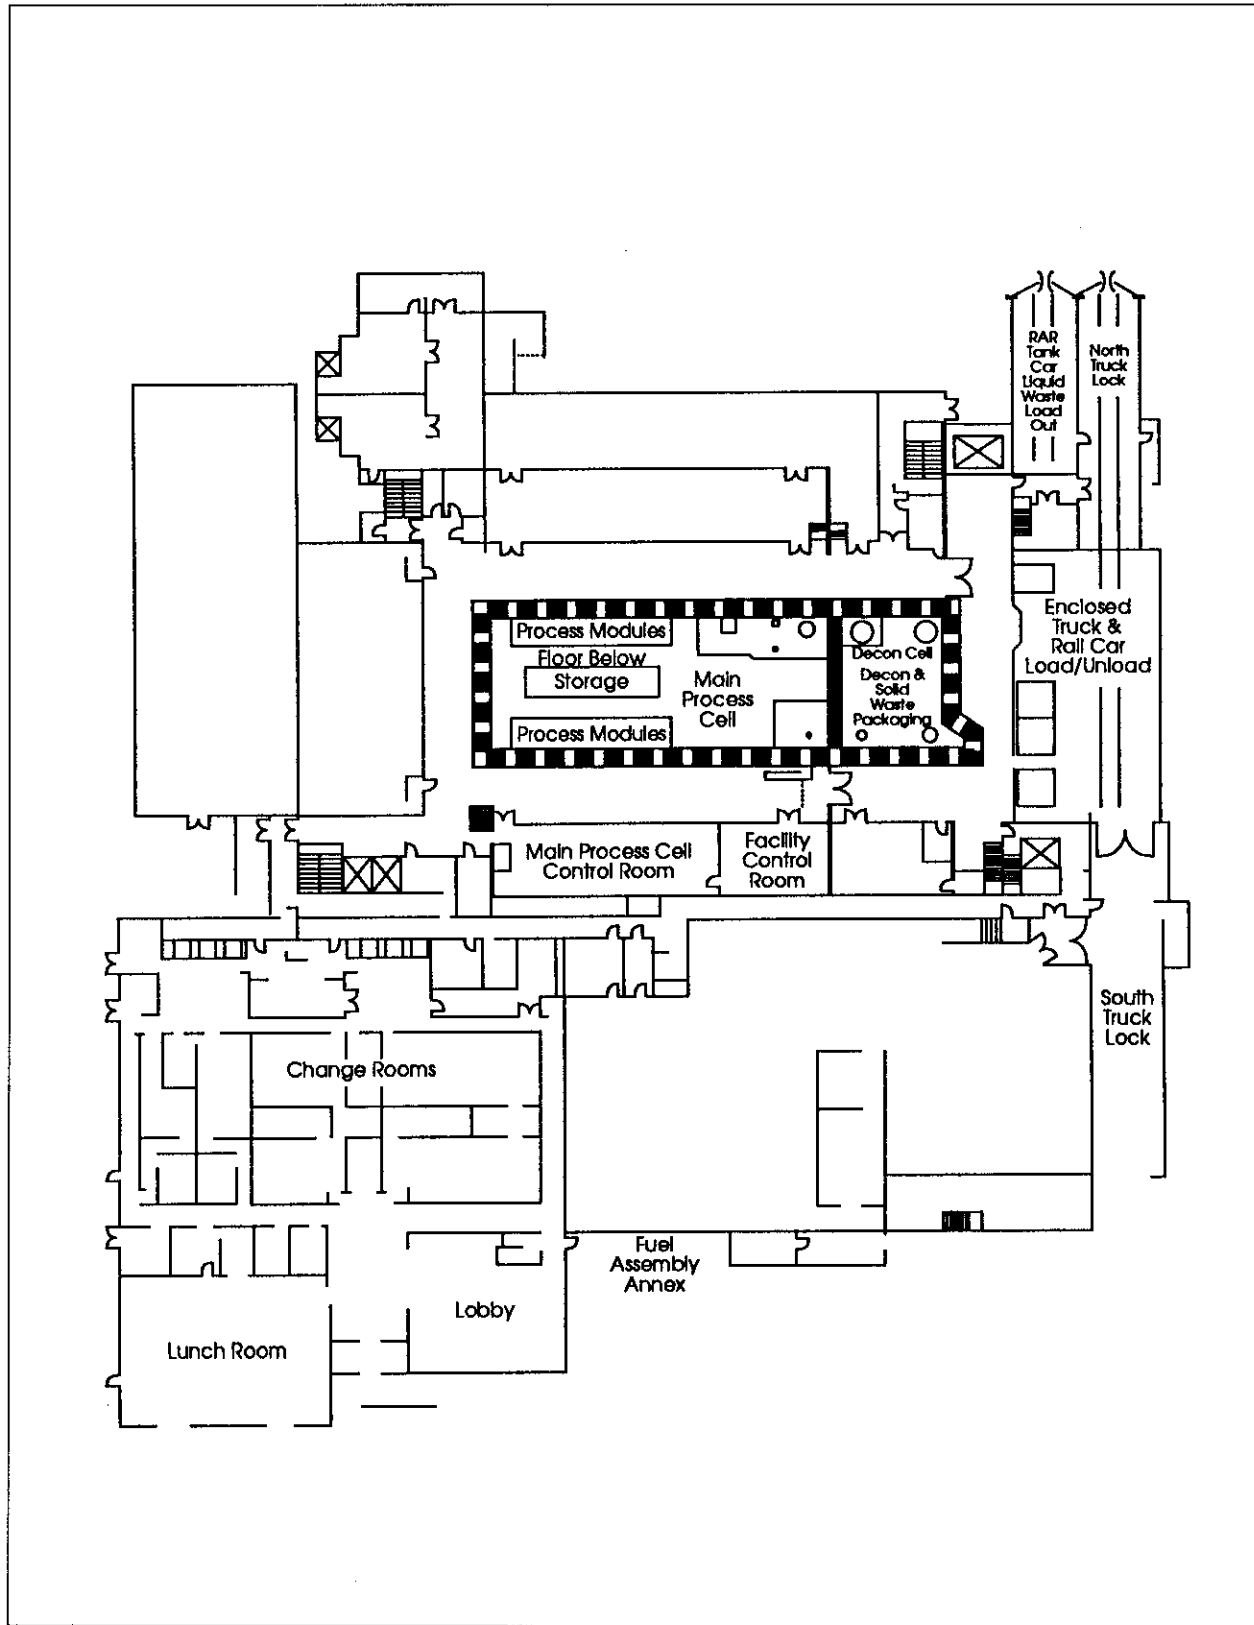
Fuel Maintenance and Examination Facility 0'-0" Level Floor Plan
